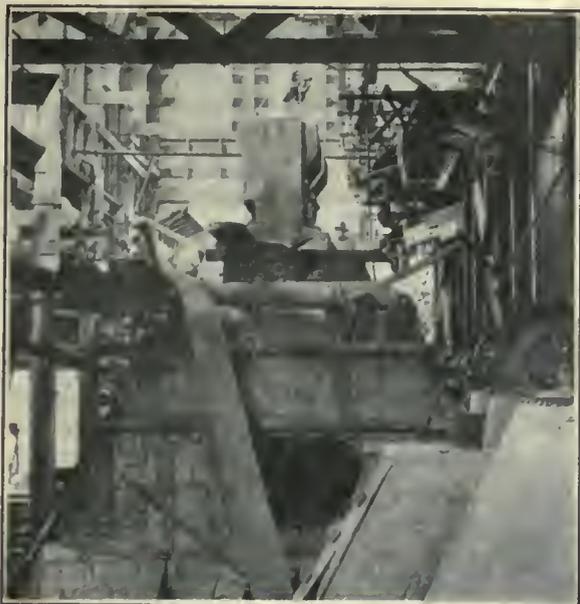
CONCRETE FOUNDATIONS FOR STAMPS.
